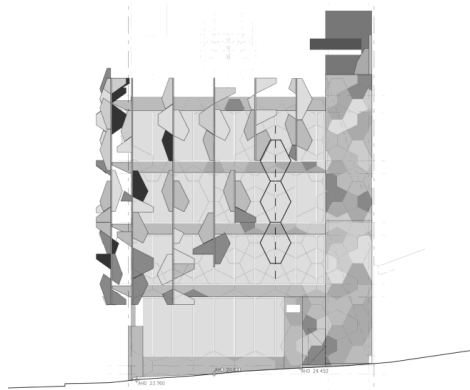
South elevation with Hexagonal tiling overlayed. Image courtesy of VDM Consulting.
